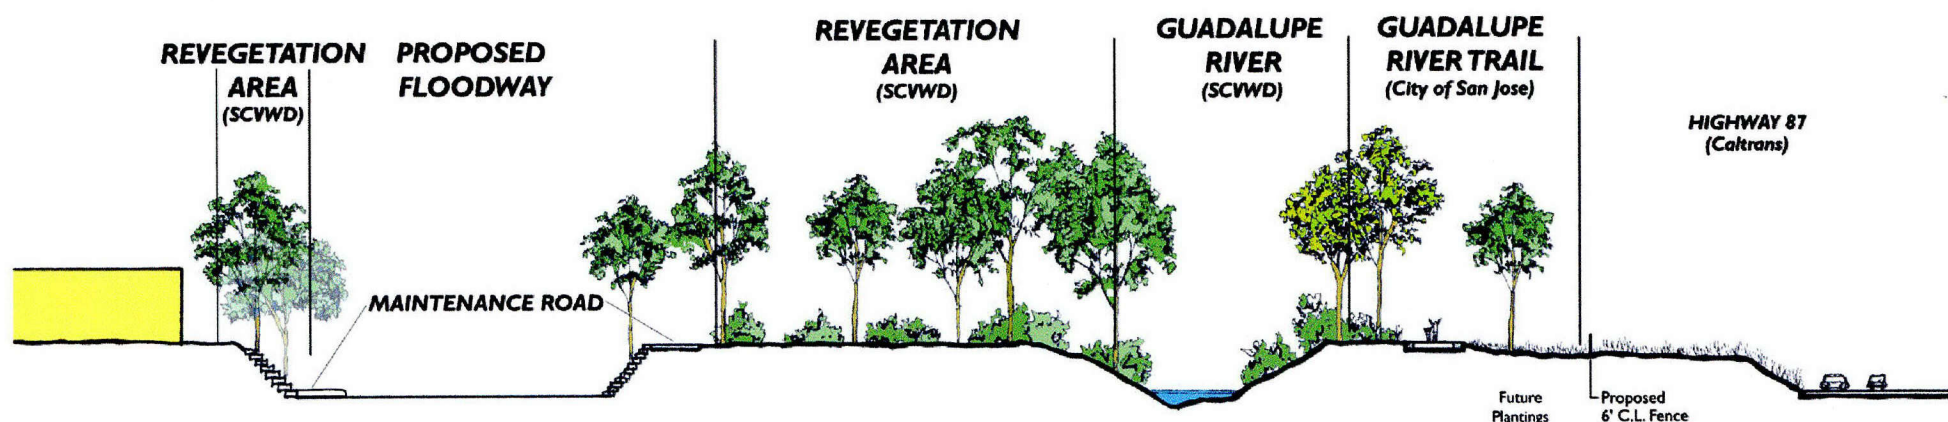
River Trail Section B-B: Looking South between Virginia Street and Grant Street
